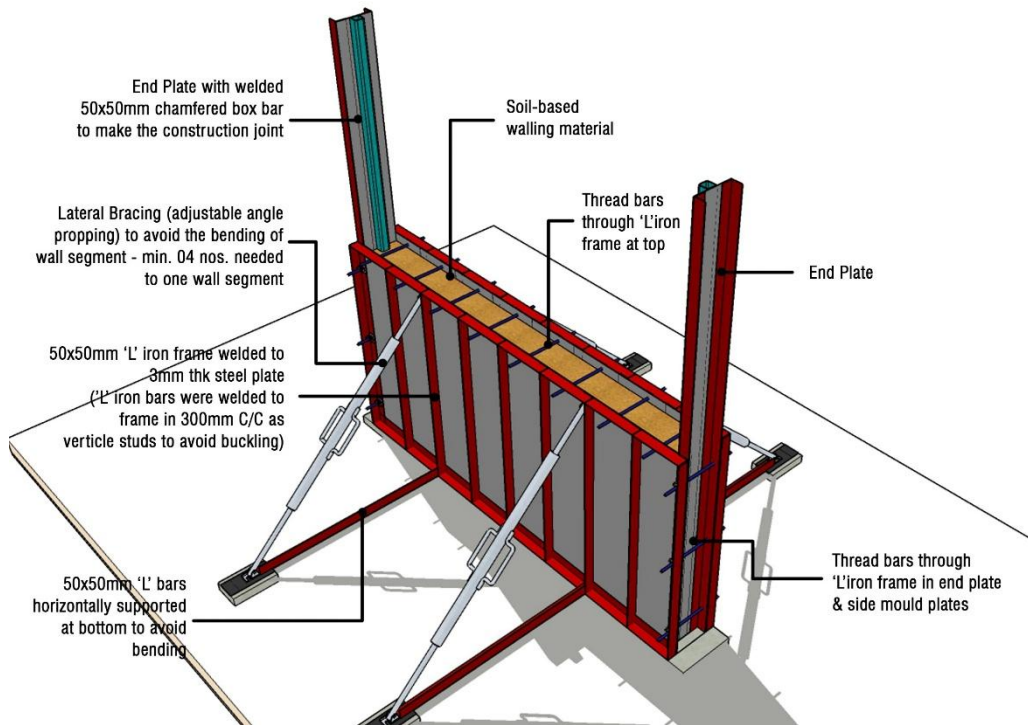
Formwork arrangement to typical wall segment - Step: 01
